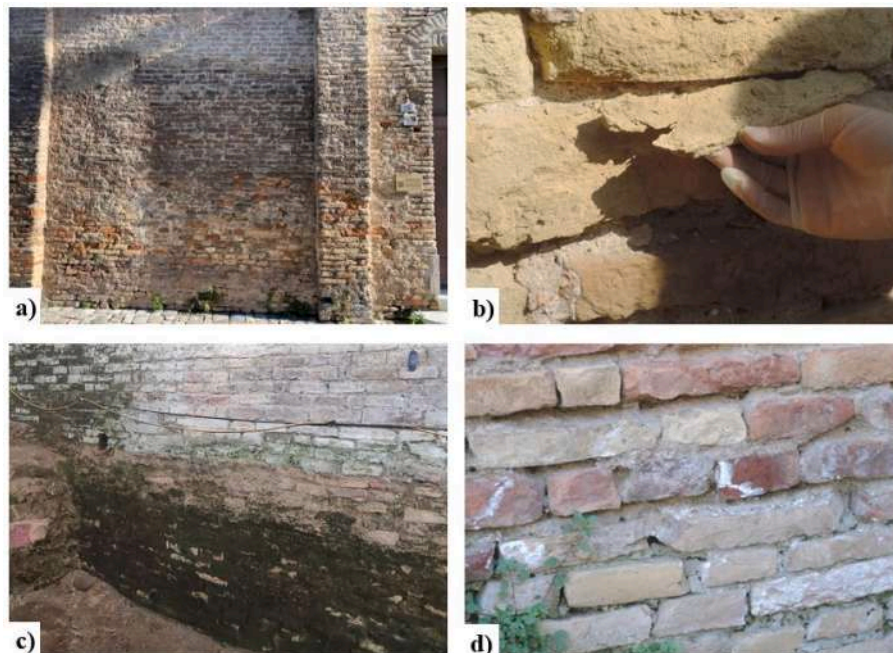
Examples of materials' deterioration patterns in the church: a) darkening due to rising damp in the main façade (west); b) flaking and scaling of bricks (south façade, exterior); c) biological patina (north wall, interior); d) salt efflorescence and deterioration of mortar joints (north wall, exterior).
